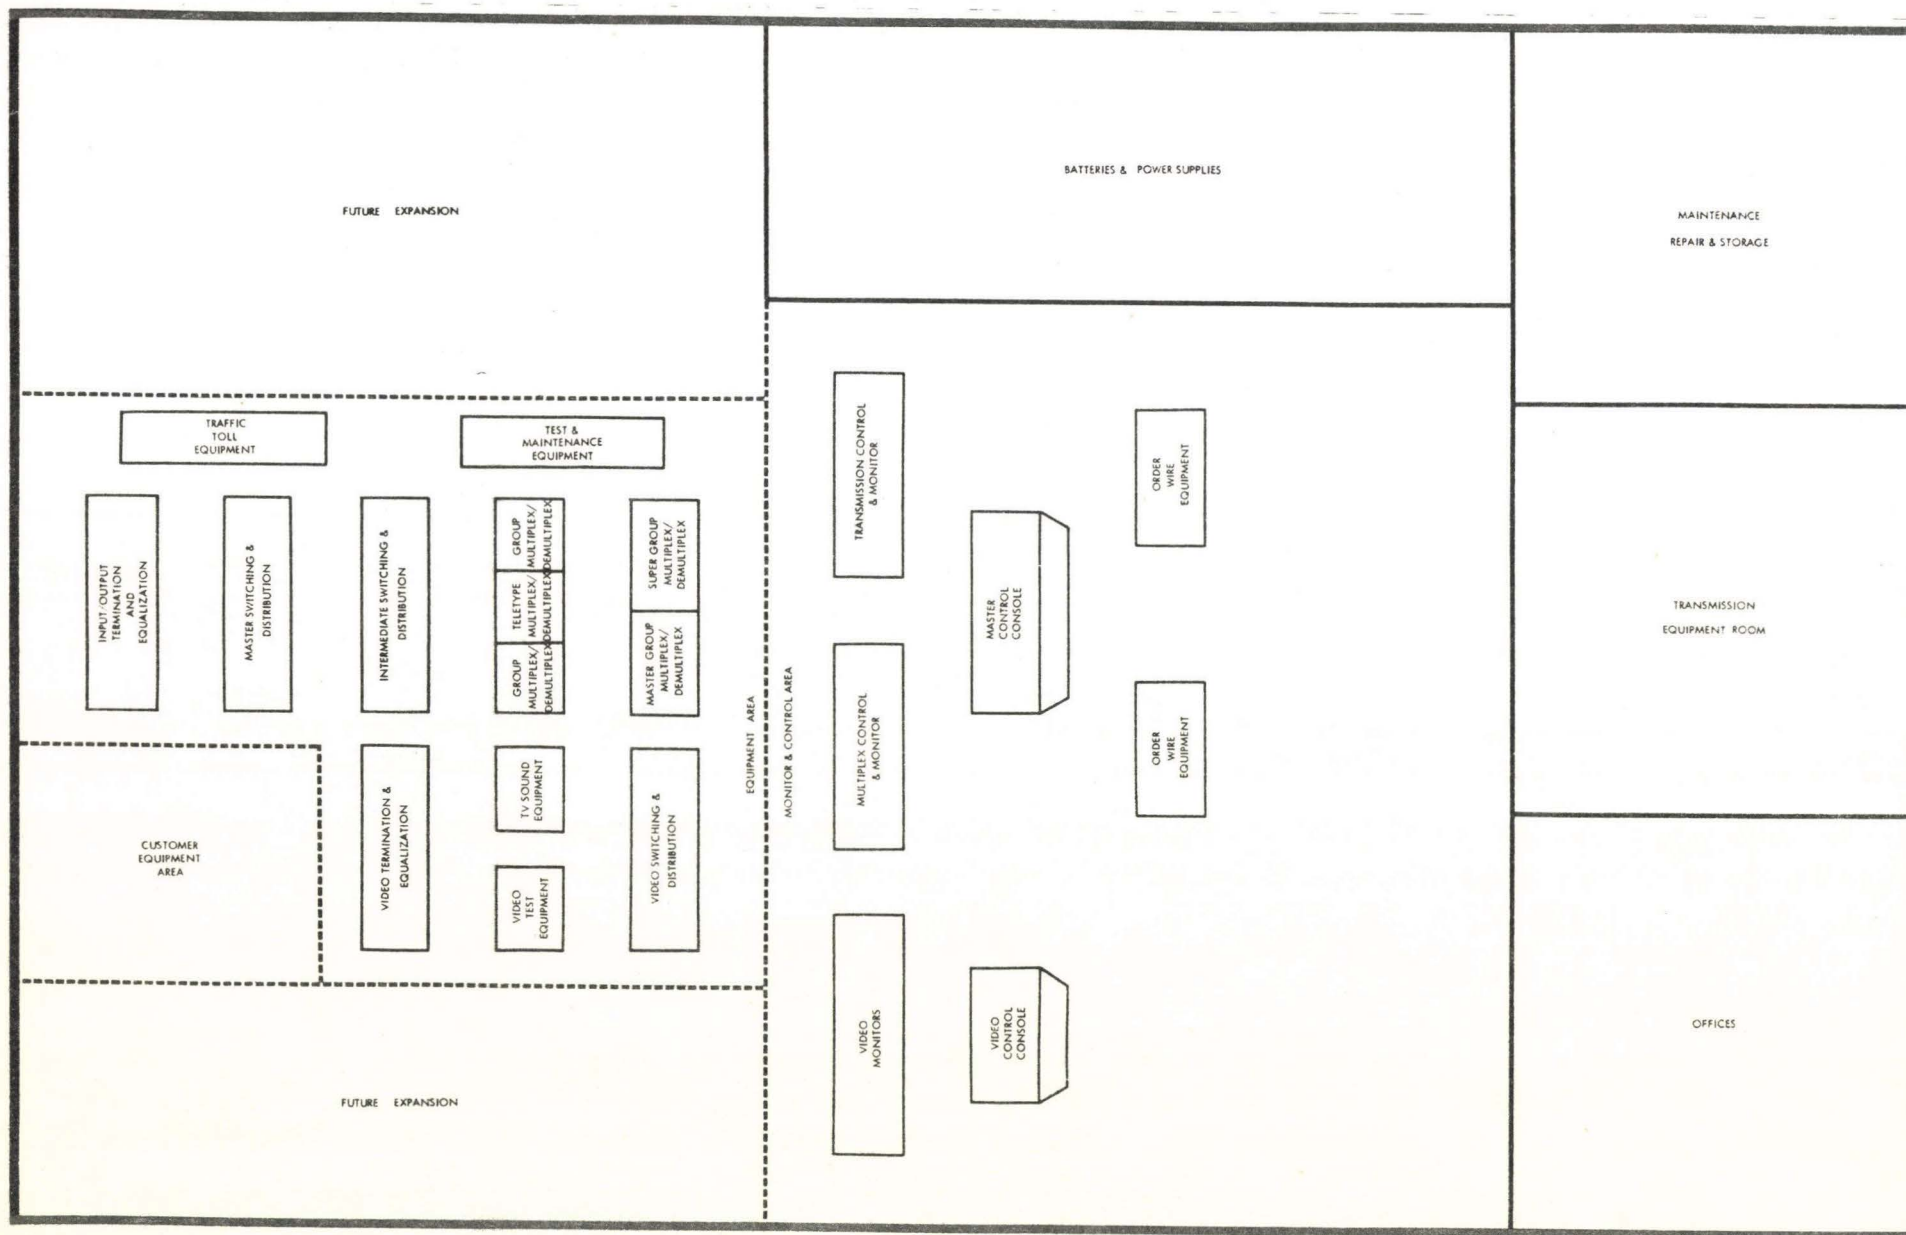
FLOOR PLAN - INTERFACE CENTER
